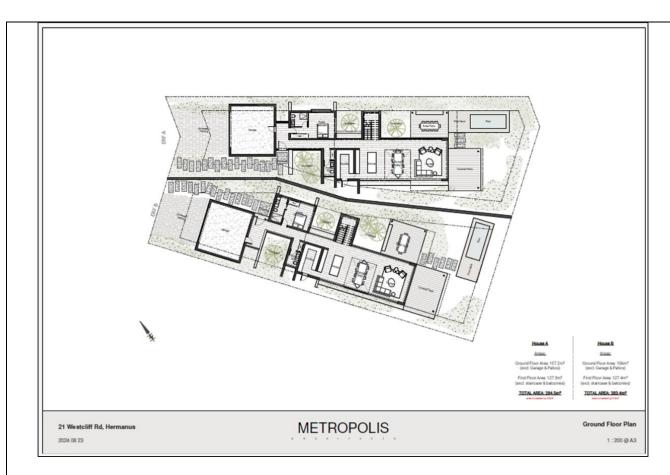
Proposed building plans of subdivided Erf 9873, Hermanus.
